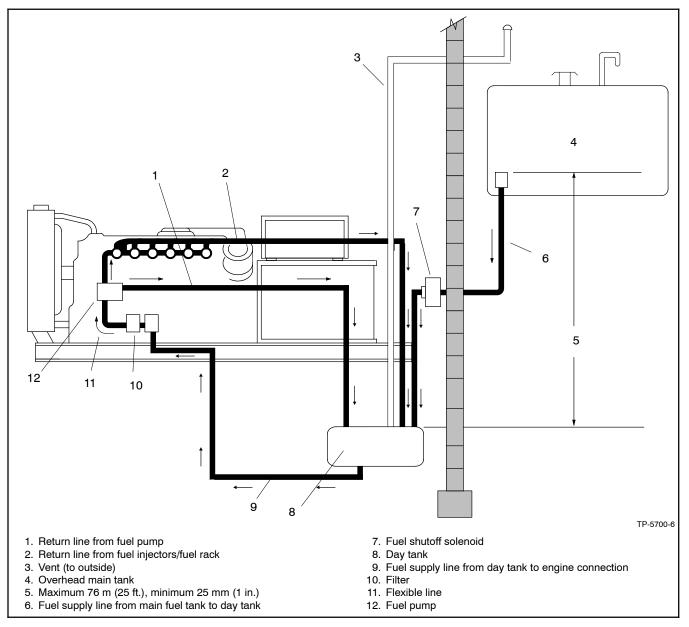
Diesel Fuel System with Overhead Main Tank and Day Tank
